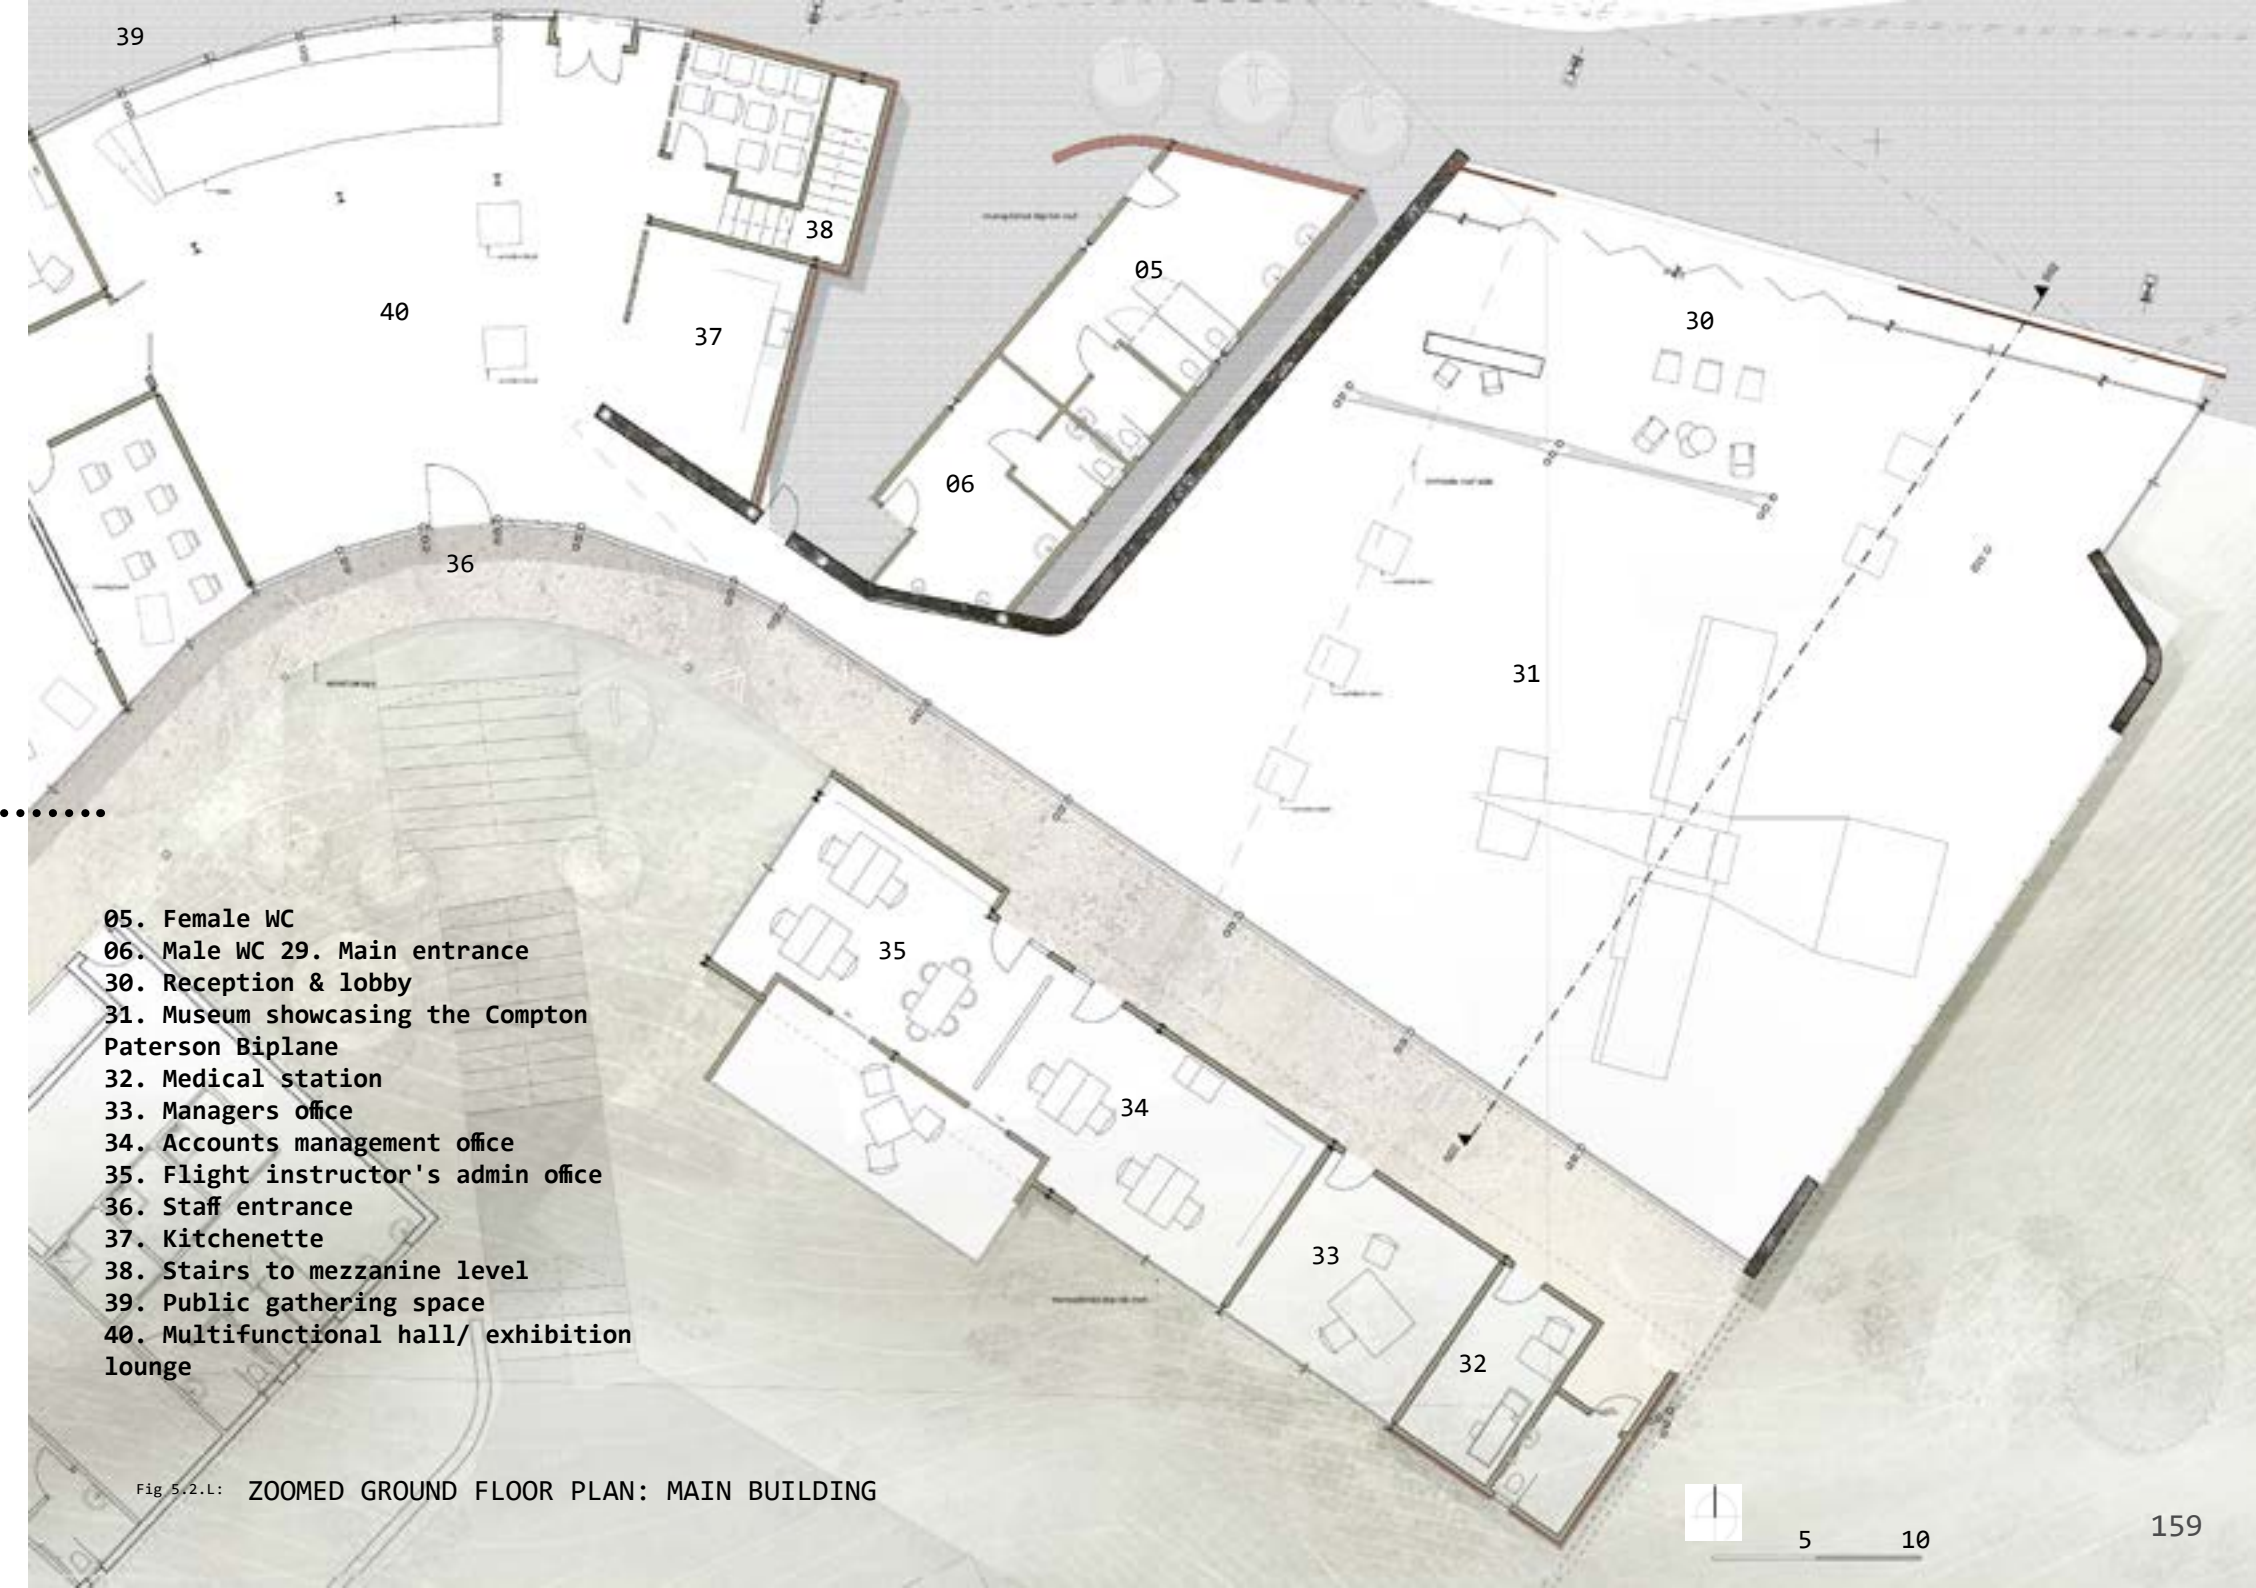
L: ZOOMED GROUND FLOOR PLAN: MAIN BUILDING
